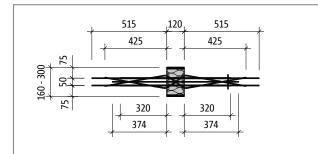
Schöck Isokorb® XT type W-M1: Product plan view
